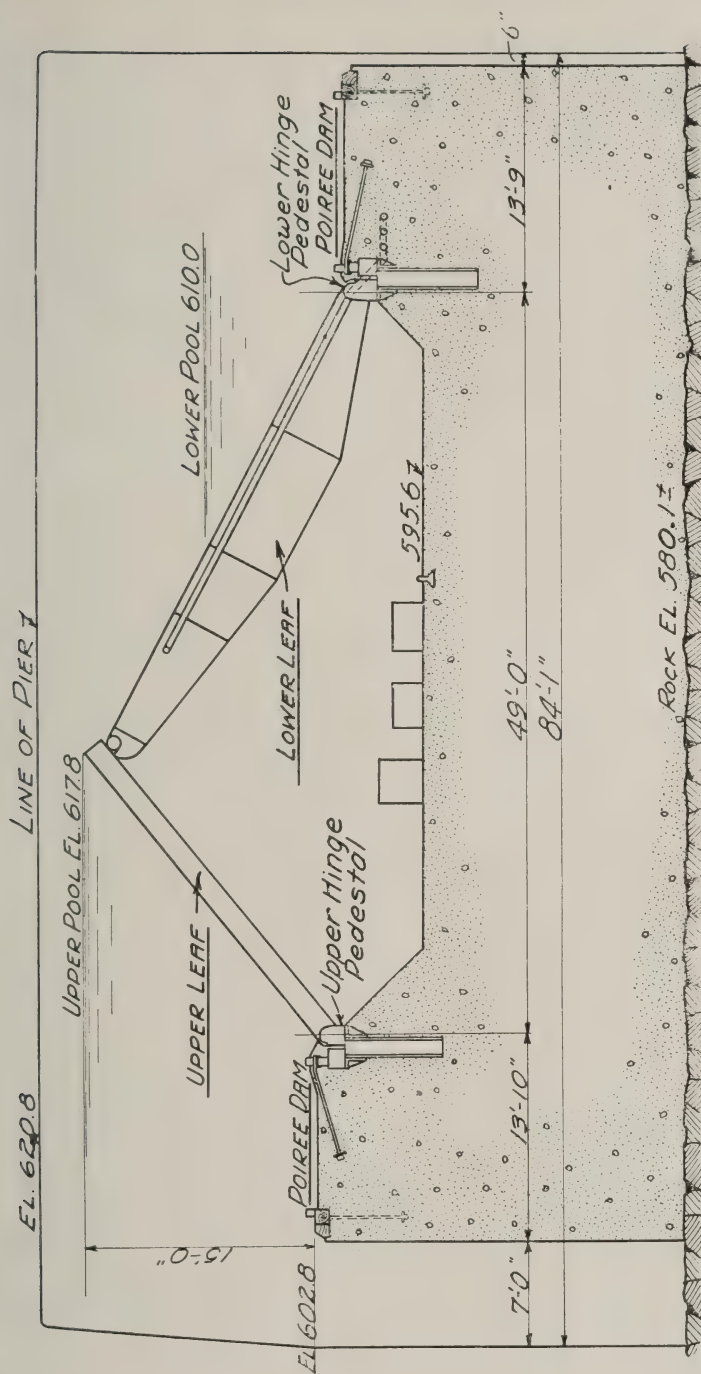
Cross section showing a design for the standard two-leaf bear-trap, to take the place of the large Reversed Parker actually built at No. 13, Ohio River. The air lines are shown in the concrete and one line shown running into the lower.
